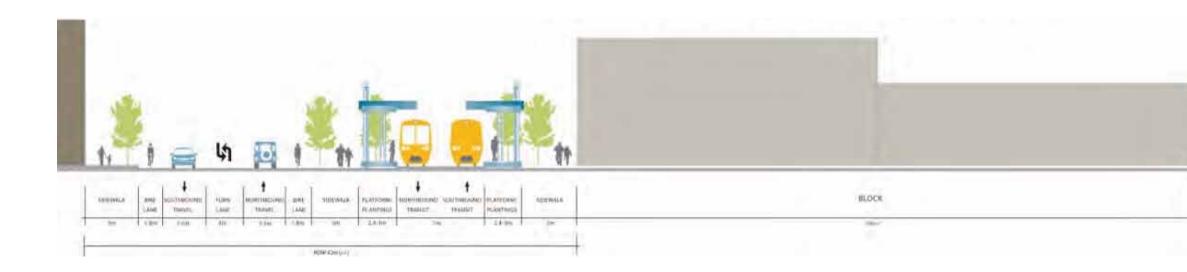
Cross-section for Cherry Street between Lake Shore Boulevard and Villiers Street (facing north)
